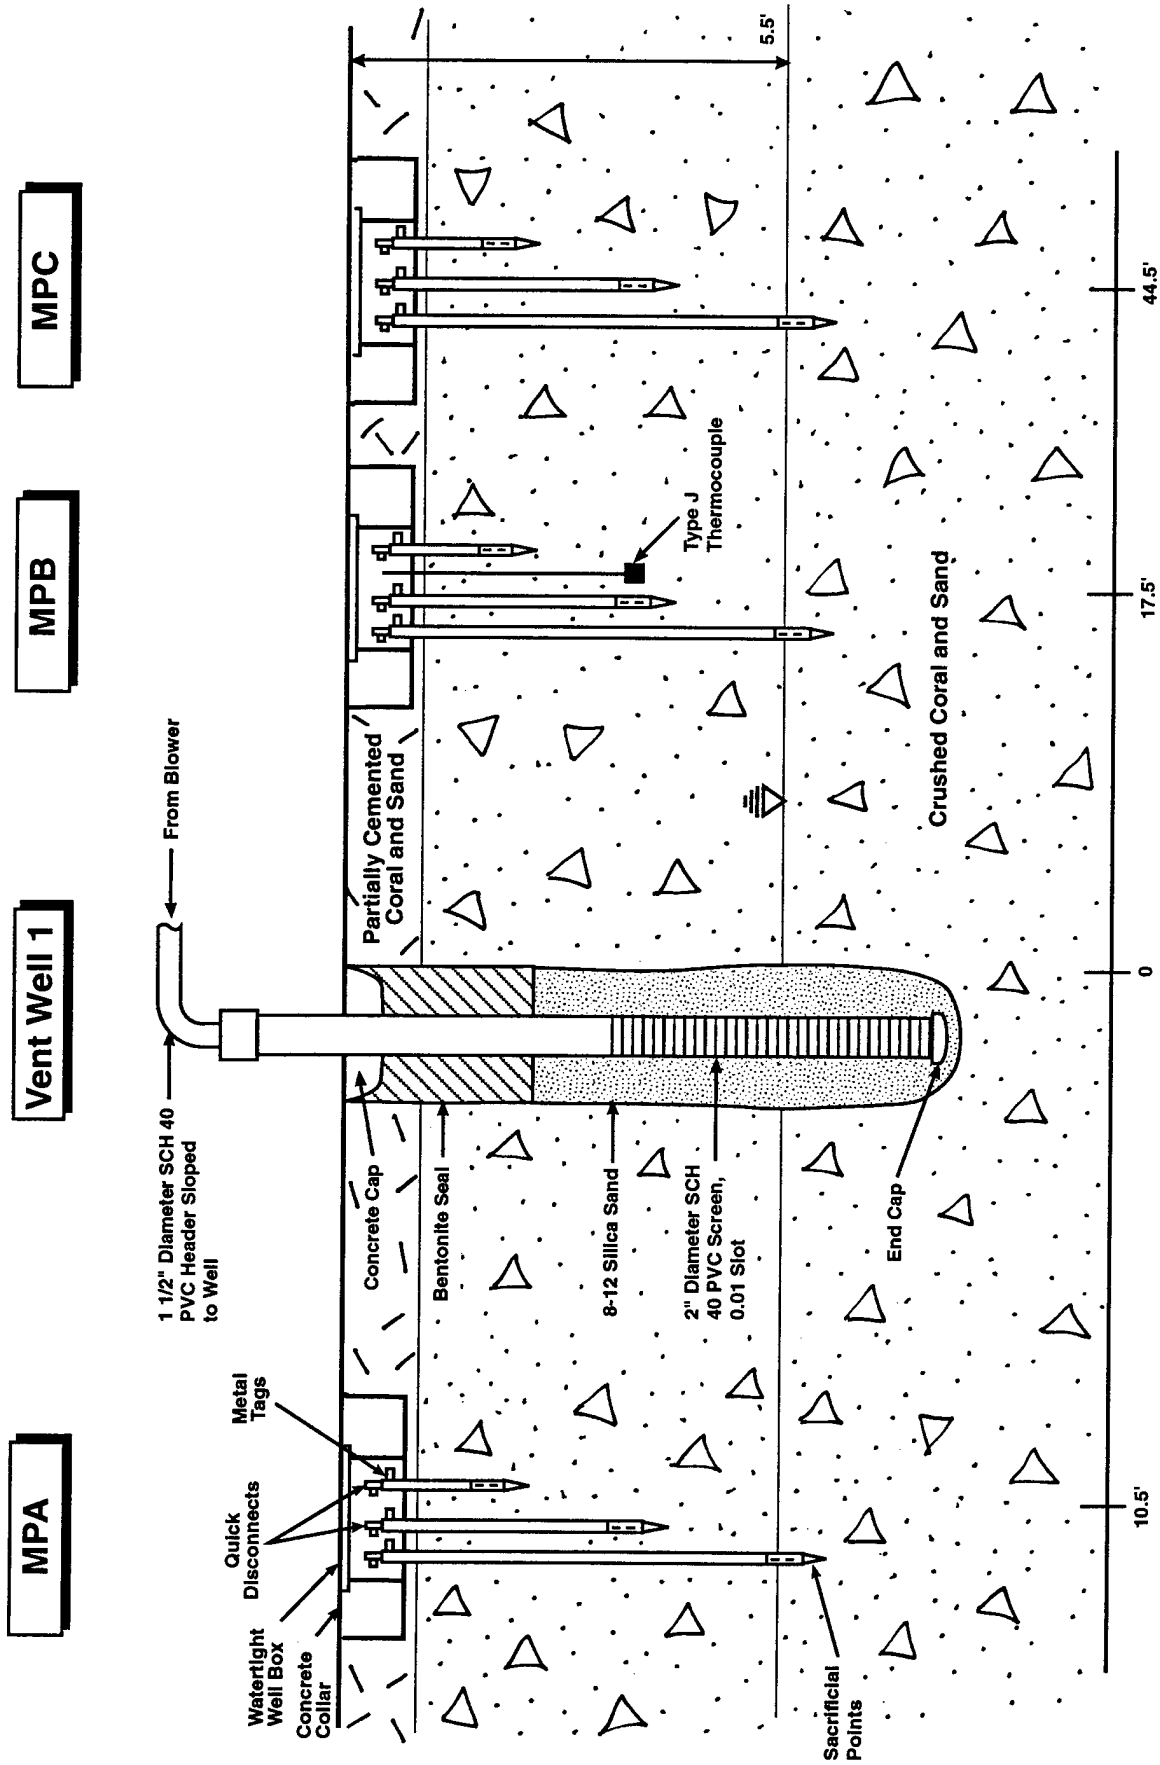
Cross Section of Vent Well and Monitoring Points at the Former POL Tank Farm Showing Site Lithology and Construction Detail (not to scale)
